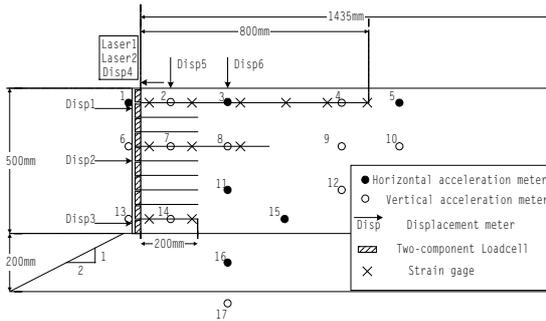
Model test set-up for reinforced soil retaining wall situated on slope (after Huang et al., 2000)
